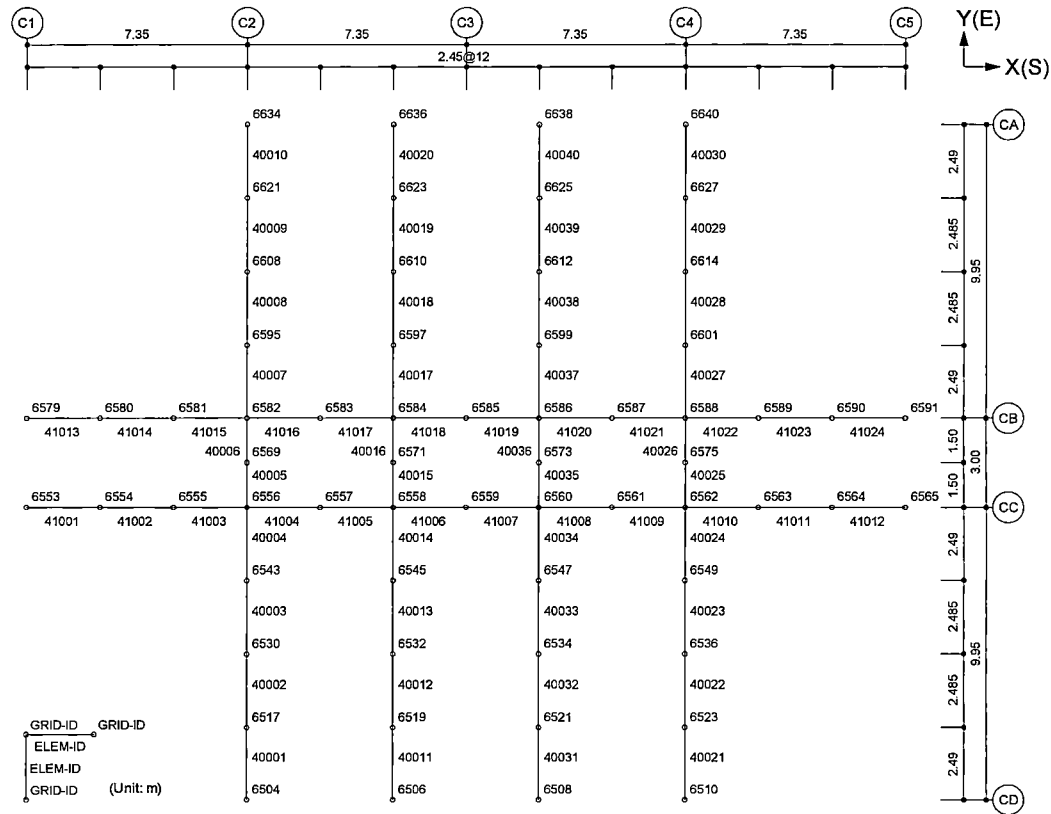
FE Model of Steel Plan, EL 4.65
